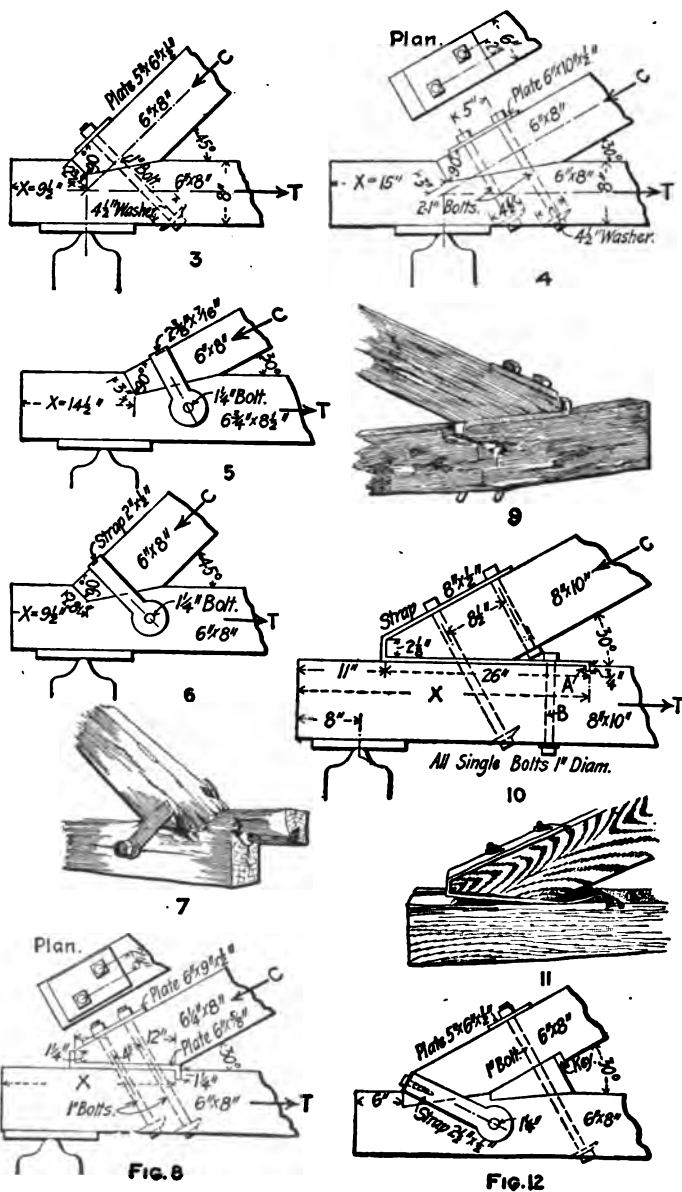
a*, *b*. Tests of End Joints of Roof Trusses.
